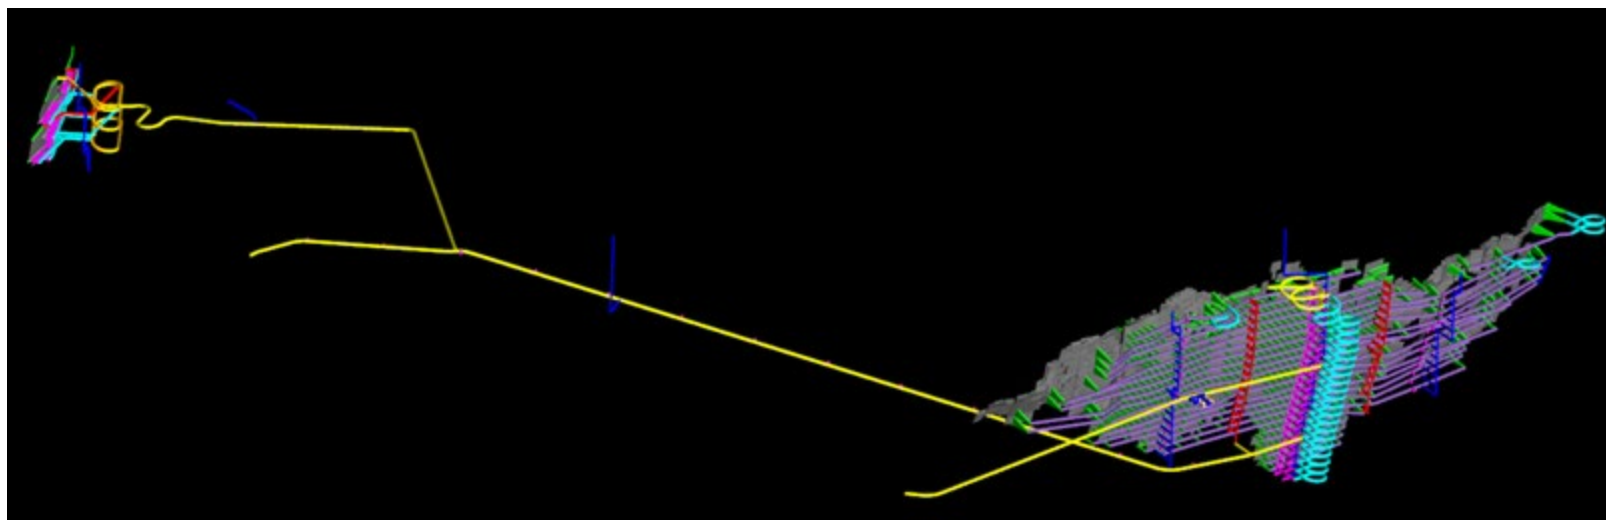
Isometric View of the Mine Design Layout (prepared by Wood, dated 2021)
